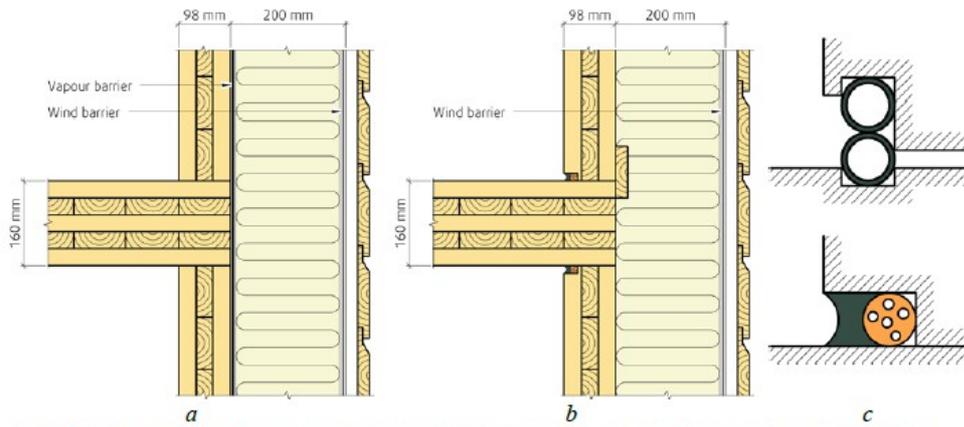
Cross section of CLT construction with separate water vapor barrier and wind barrier (a), and local sealing of joints between floor and wall elements with separate wind barrier under a ventilated wooden cladding (b). Examples of local sealing with rubber molding or sealing compound.
